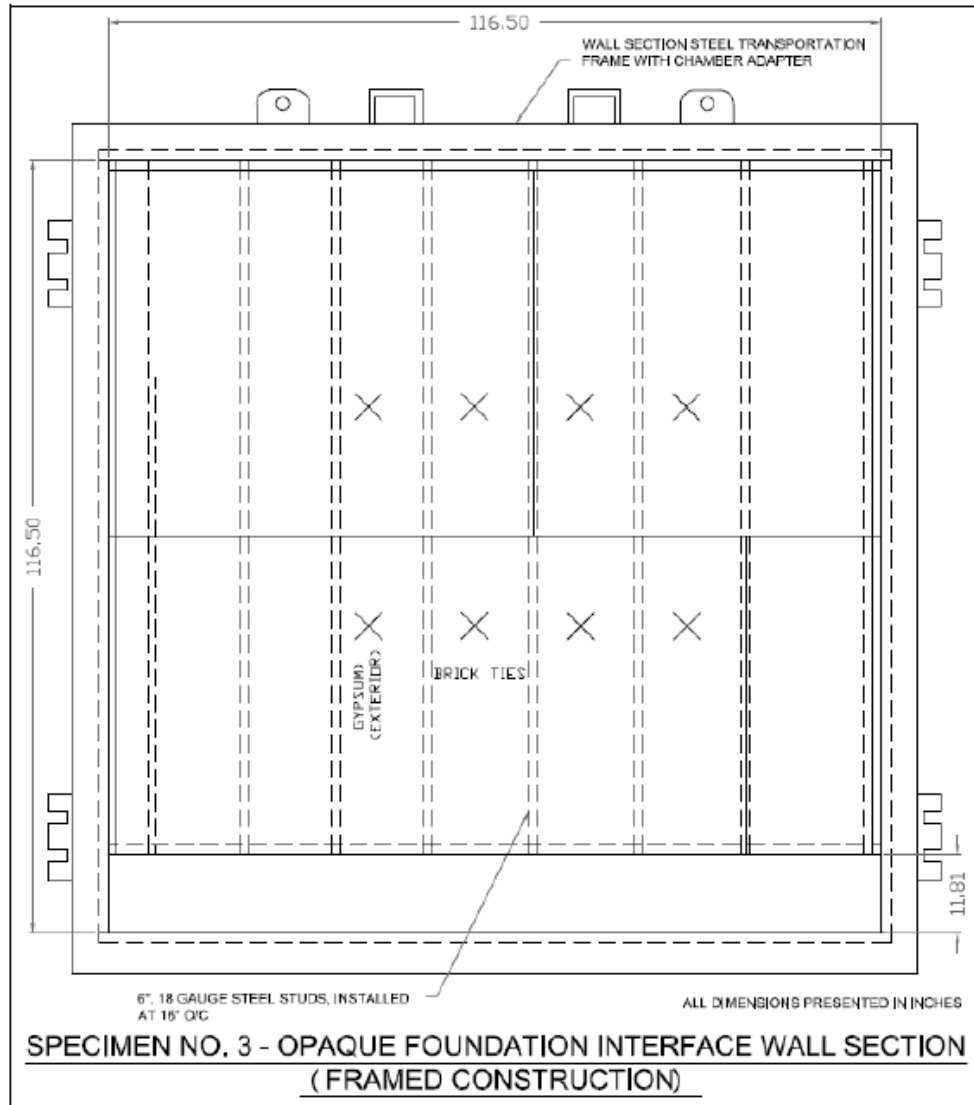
Element Specimen 20-06-B0040-SS-CB-3 Gauge Locations
